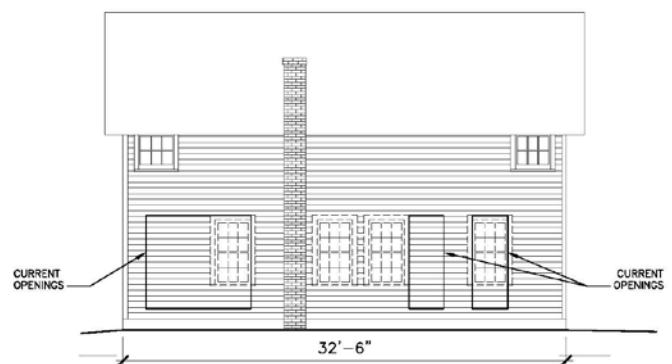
Speculation of original 1902 southern façade. Current openings highlighted with solid dark line.
